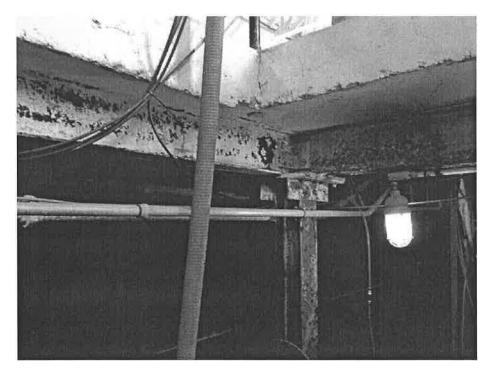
View of Lead-Based White Paint (0.73-1.1%wt) on Horizontal Structural Beam near Filter#25.
